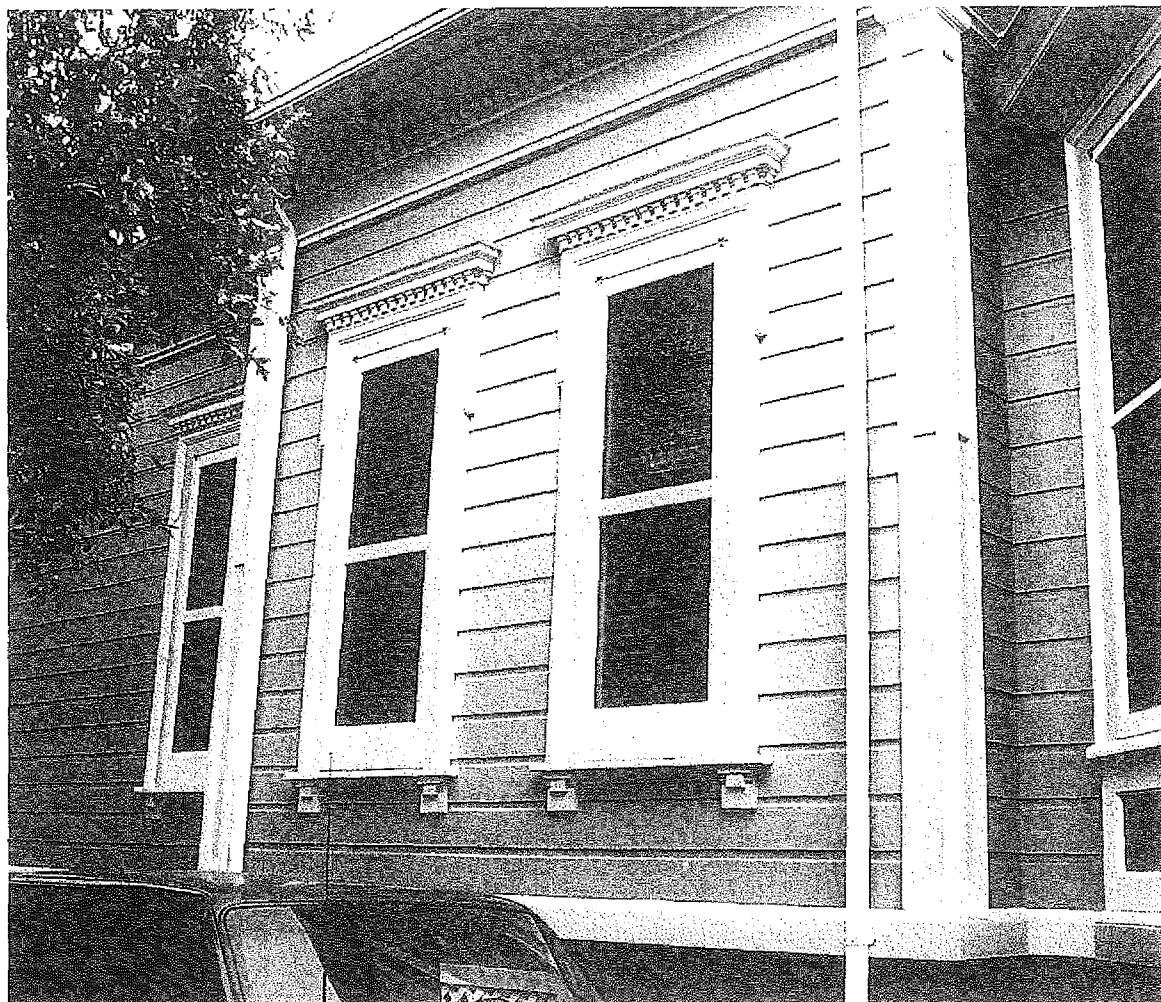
Side windows and dining room bay windows. Note decoration on architraves as compared to Figure 10b.
